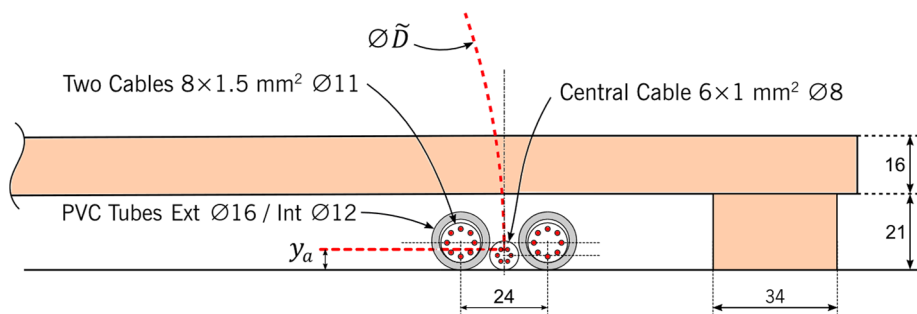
Cross-section of the prototype inductive of lane, detail of primary coil winding, dimensions in mm.
